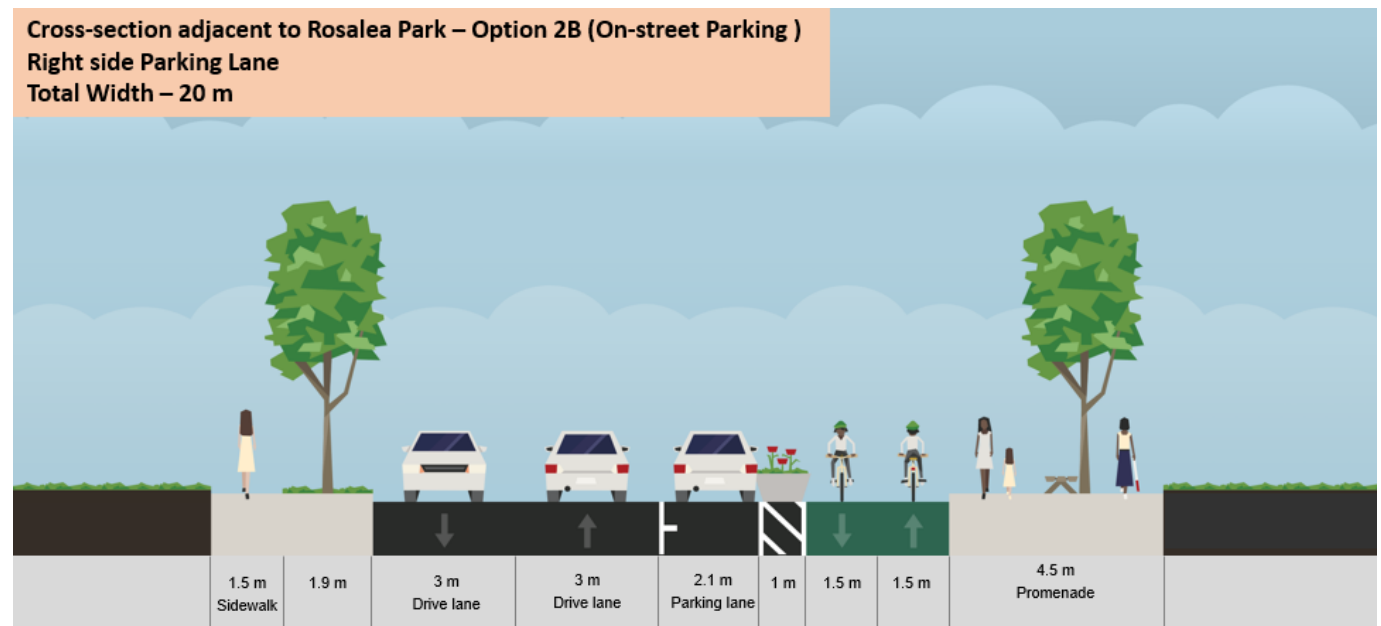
PROPOSED CONCEPT – CONVENTIONAL MULTIMODAL STREET CROSS-SECTION
